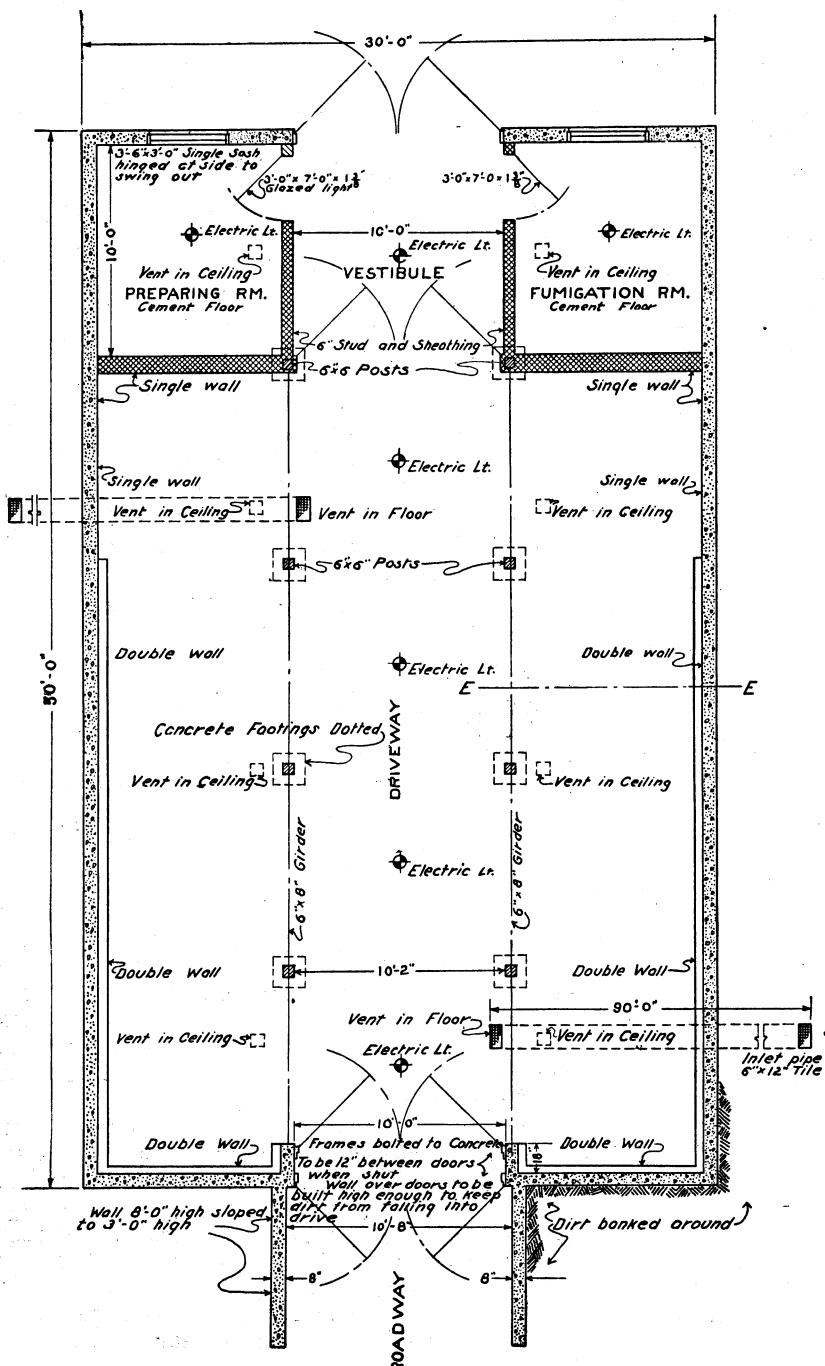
Ground plan of the potato storage cellar at Jerome, Idaho.
